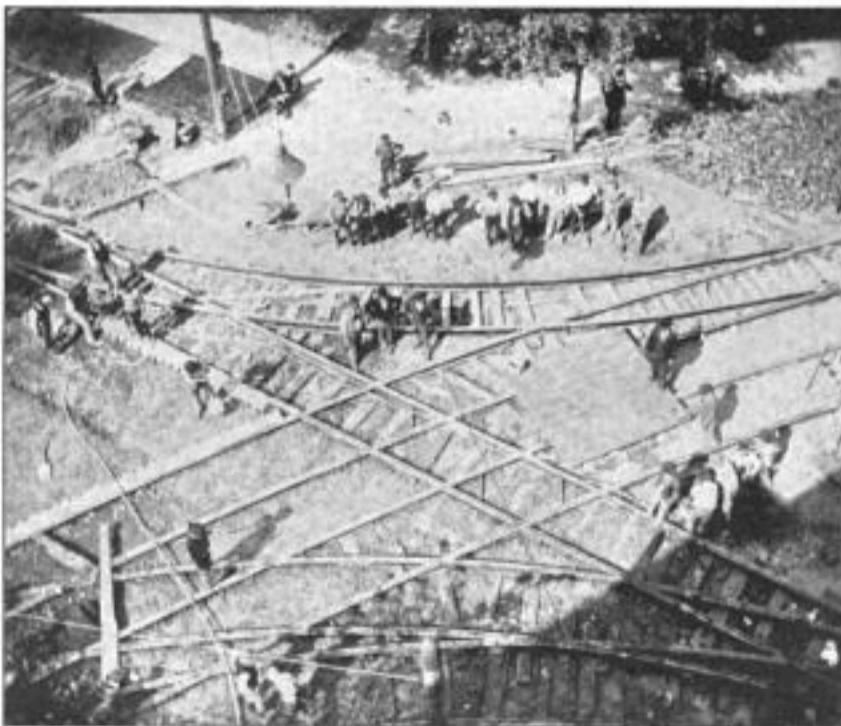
GIRDER RAIL SPECIAL WORK, AT CORNER OF LEWIS AND CHENANGO STREETS.
